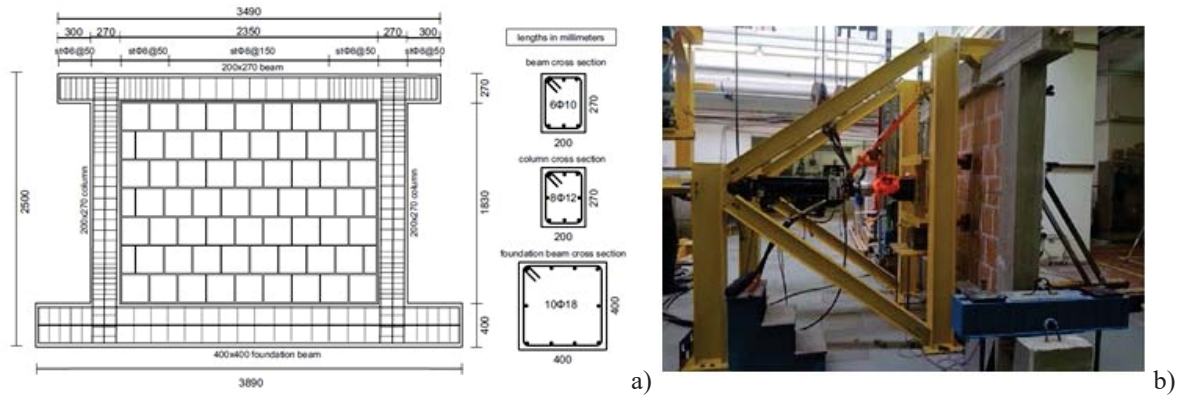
Specimen 80_OOP_4E by Ricci et al. 2018 [5]: a) Design details of the specimen; b) Test setup.
